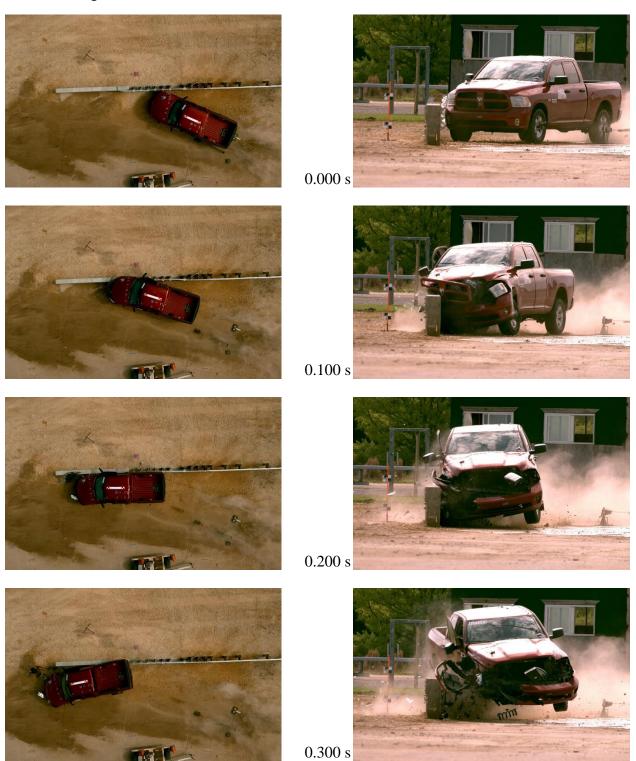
Sequential Photographs for Test No. 469549-01-4 (Overhead and Frontal Views).
